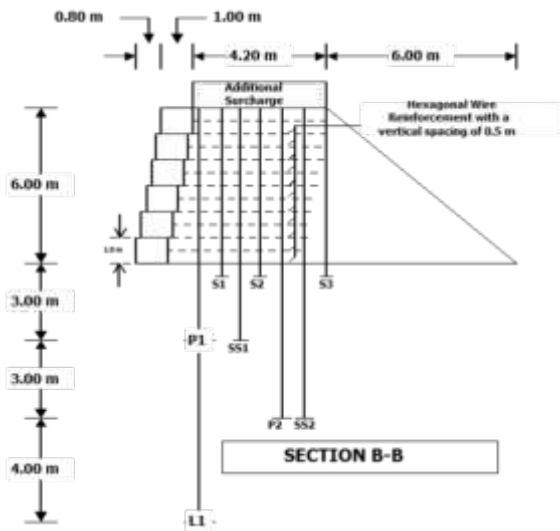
Section B-B view of hexagonal wire mesh reinforced embankment.
